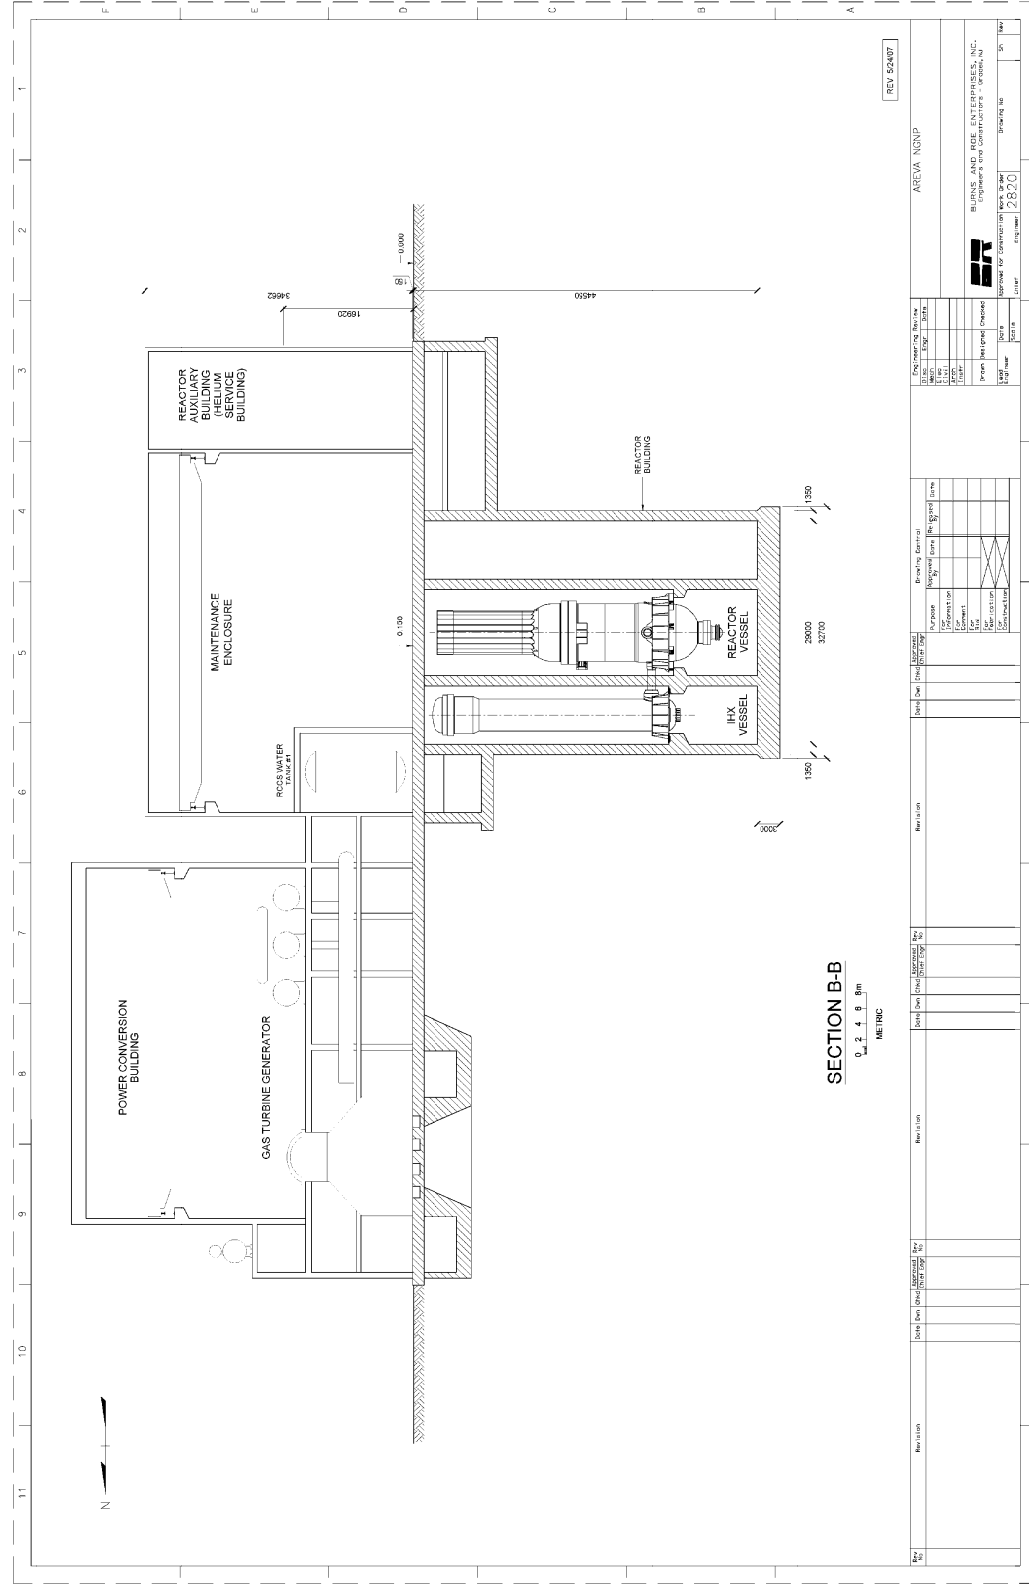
SK_S003 NGNP - Elevation – Section BB
